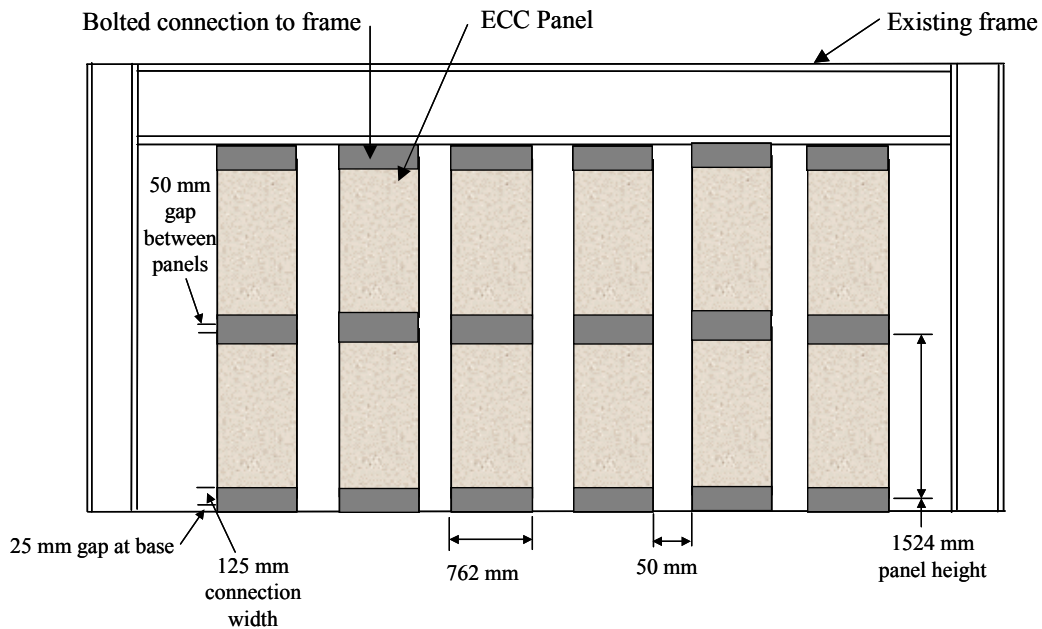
Schematic of frame with 6 beam-type infill sections added (*not to scale*)
